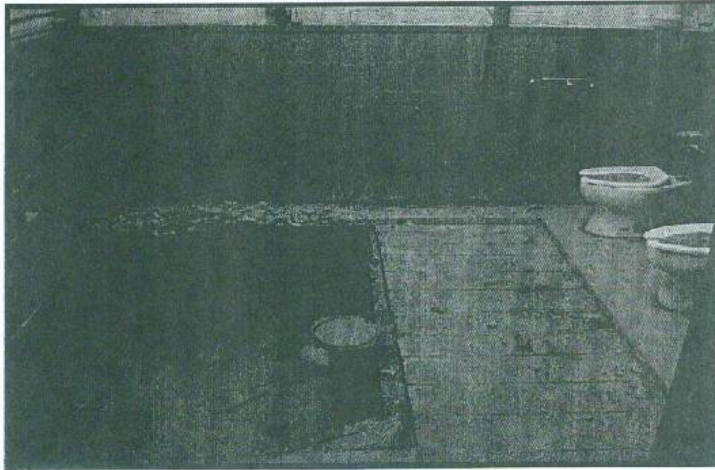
Men's Room in Center of Building where New Sewer Main begins.
